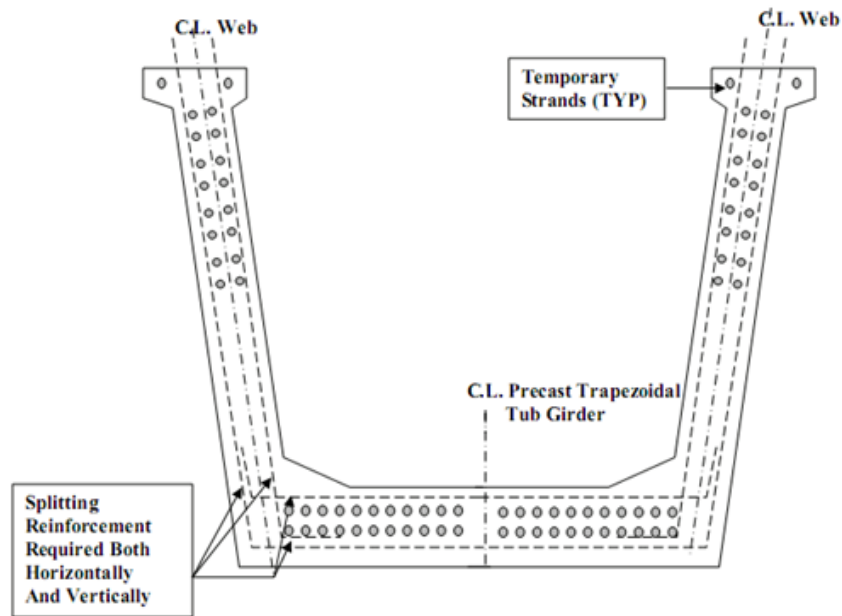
Required splitting reinforcement for a trapezoidal tub girder
